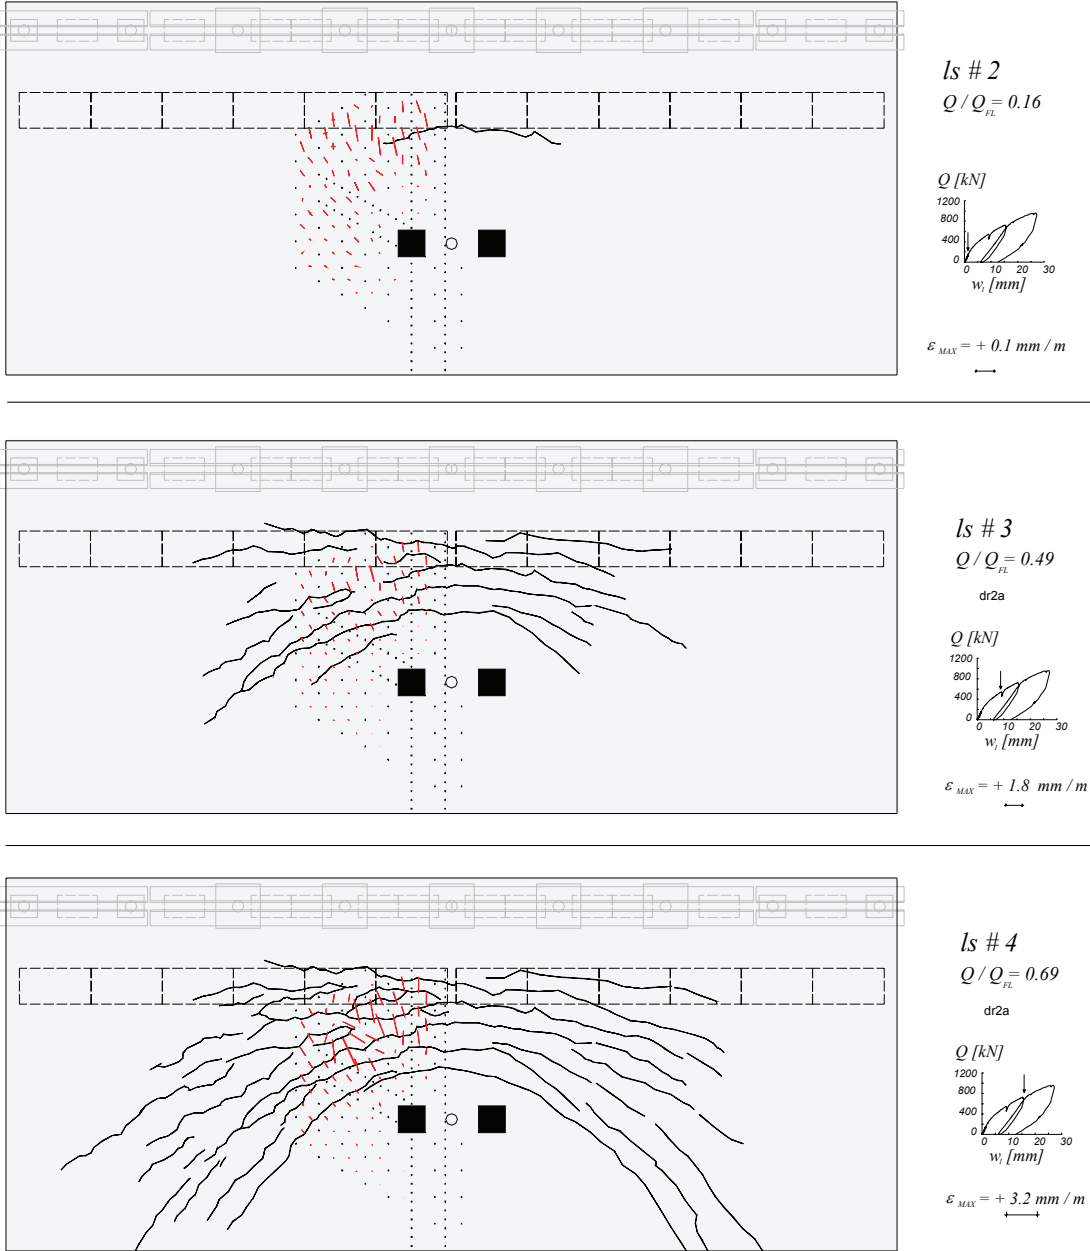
Test DR2-a: Crack pattern and tensile principal strains on the top surface
